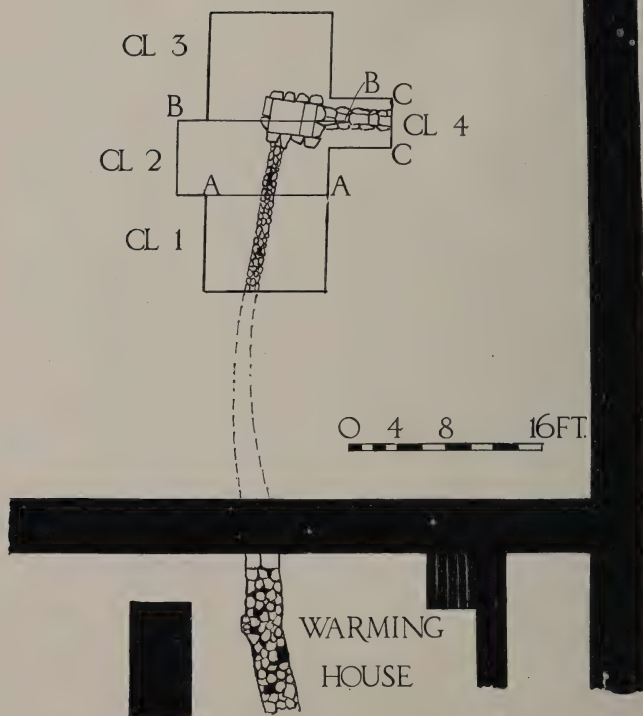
PLAN OF SOUTH EAST OF CLOISTER AND NORTH OF WARMING HOUSE. Note Sections A, B and C.
